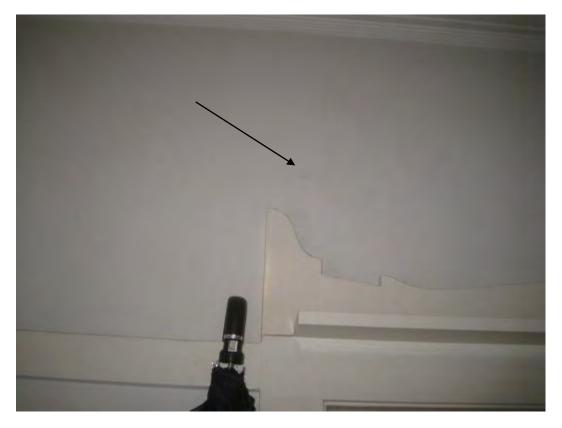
shows flaking / lifting paint from the Living room ceiling
